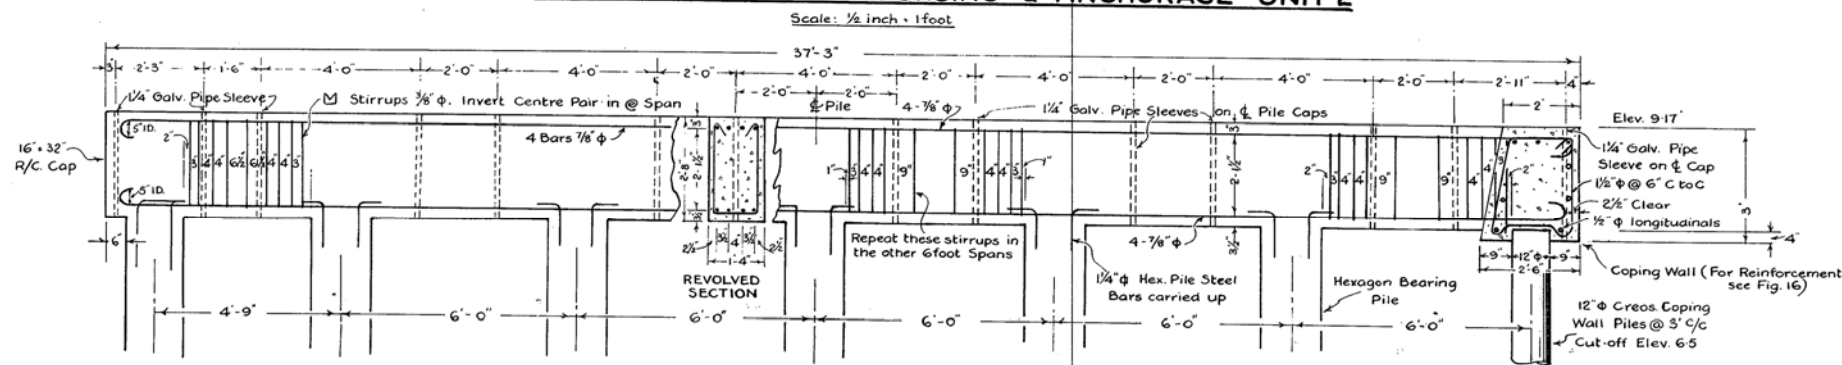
PILE CAP REINFORCING & ANCHORAGE - UNIT 1.
